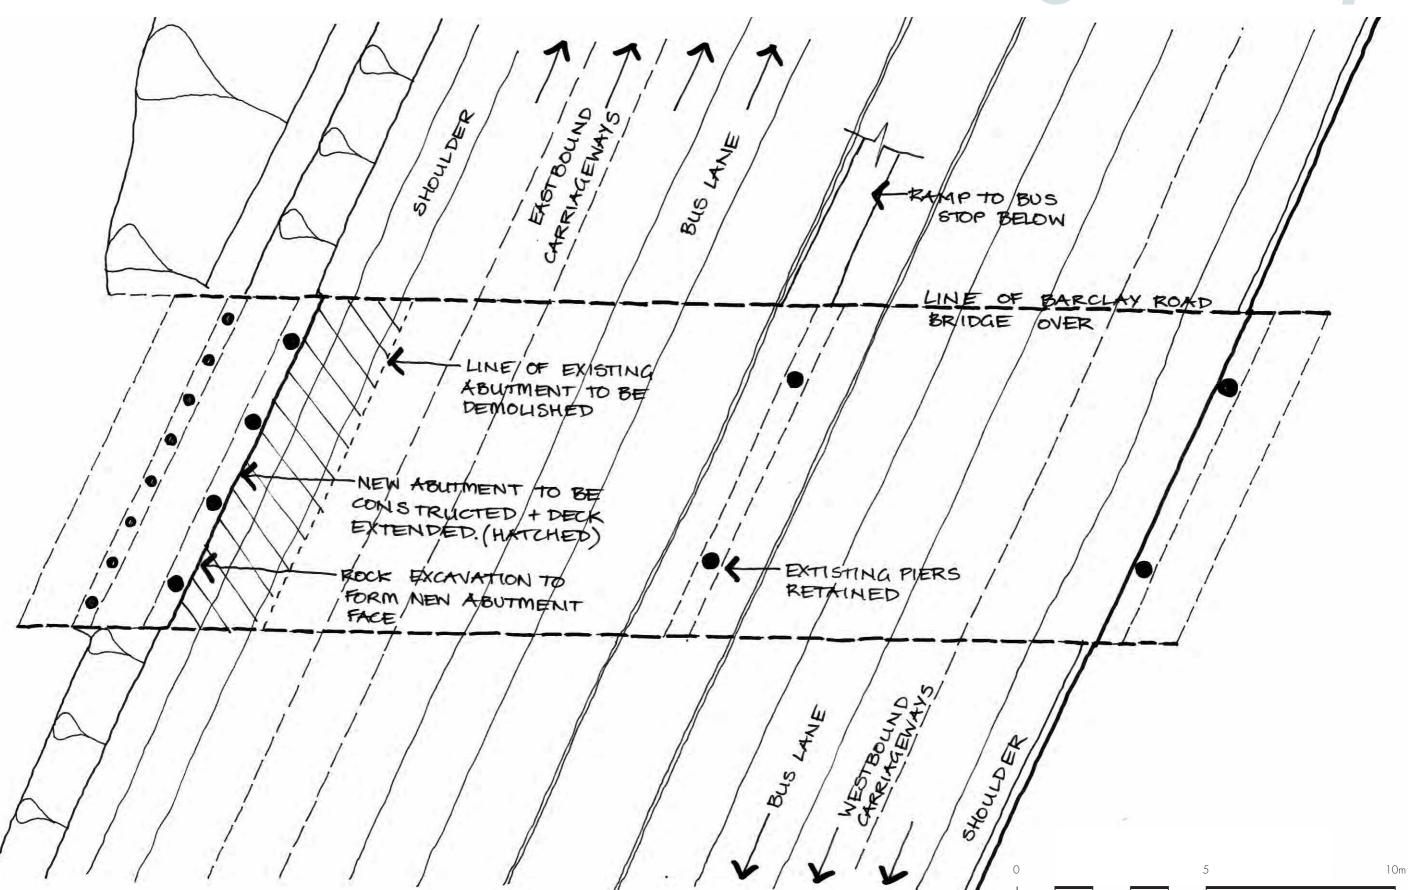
Bridge 2.2 Barclay Road Overbridge - Plan
